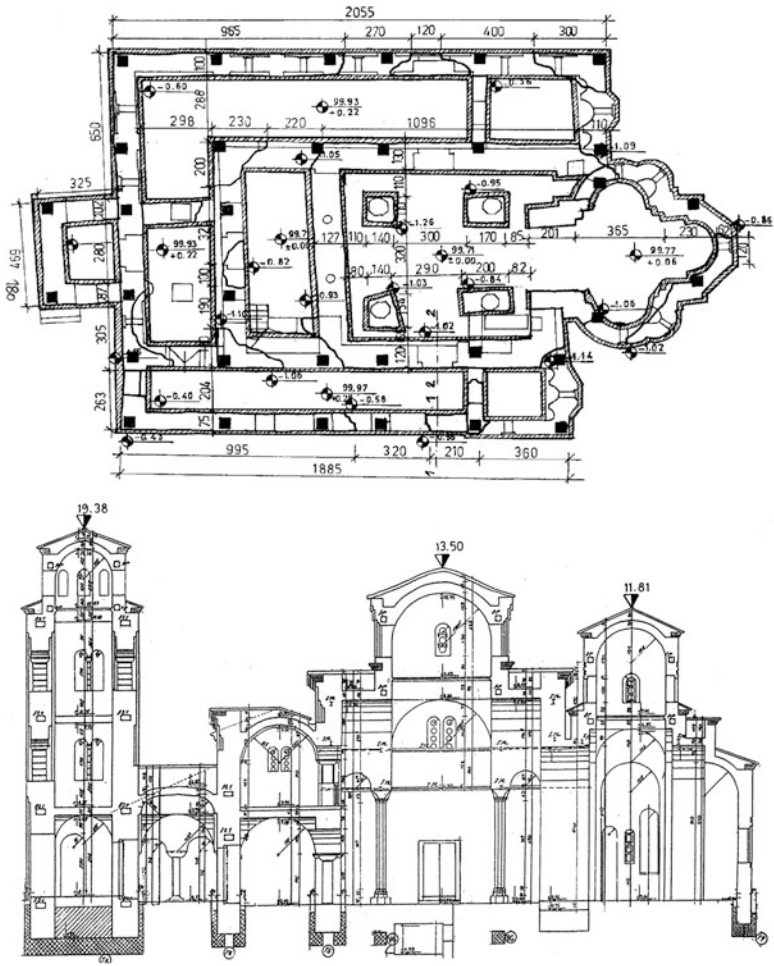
Plan at level -0.22 m and cross section of the structure
